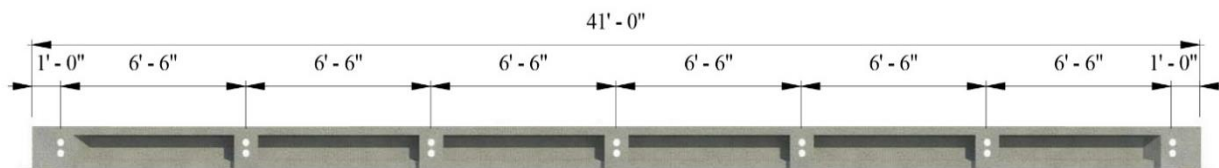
Longitudinal view of a decked bulb T beam
